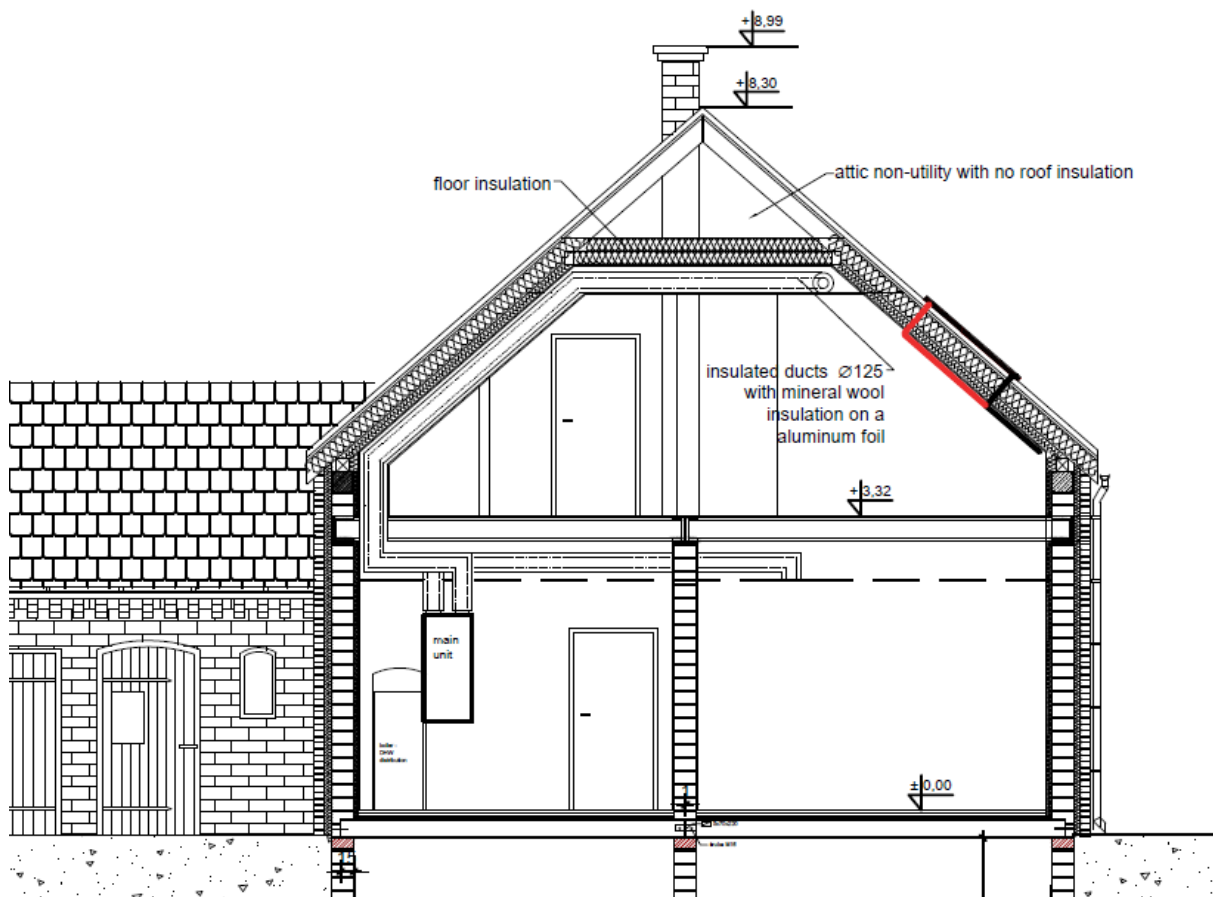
Ventilation ducts routed in space of ceiling with floor insulated - between the first floor and the unheated space.
